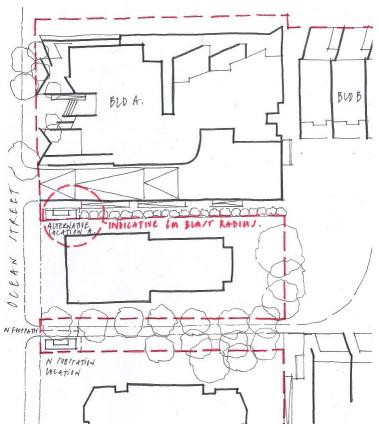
Extent of the 6m blast zone if the substation is located adjacent to Building A
